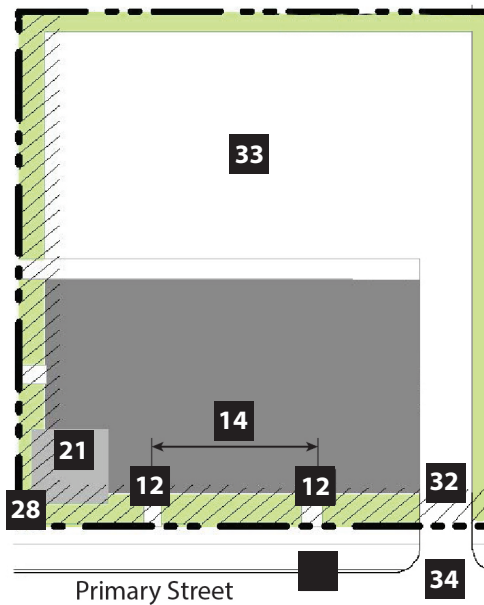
General building siting diagram shown with corner tower and rear vehicular access. Not to scale.
